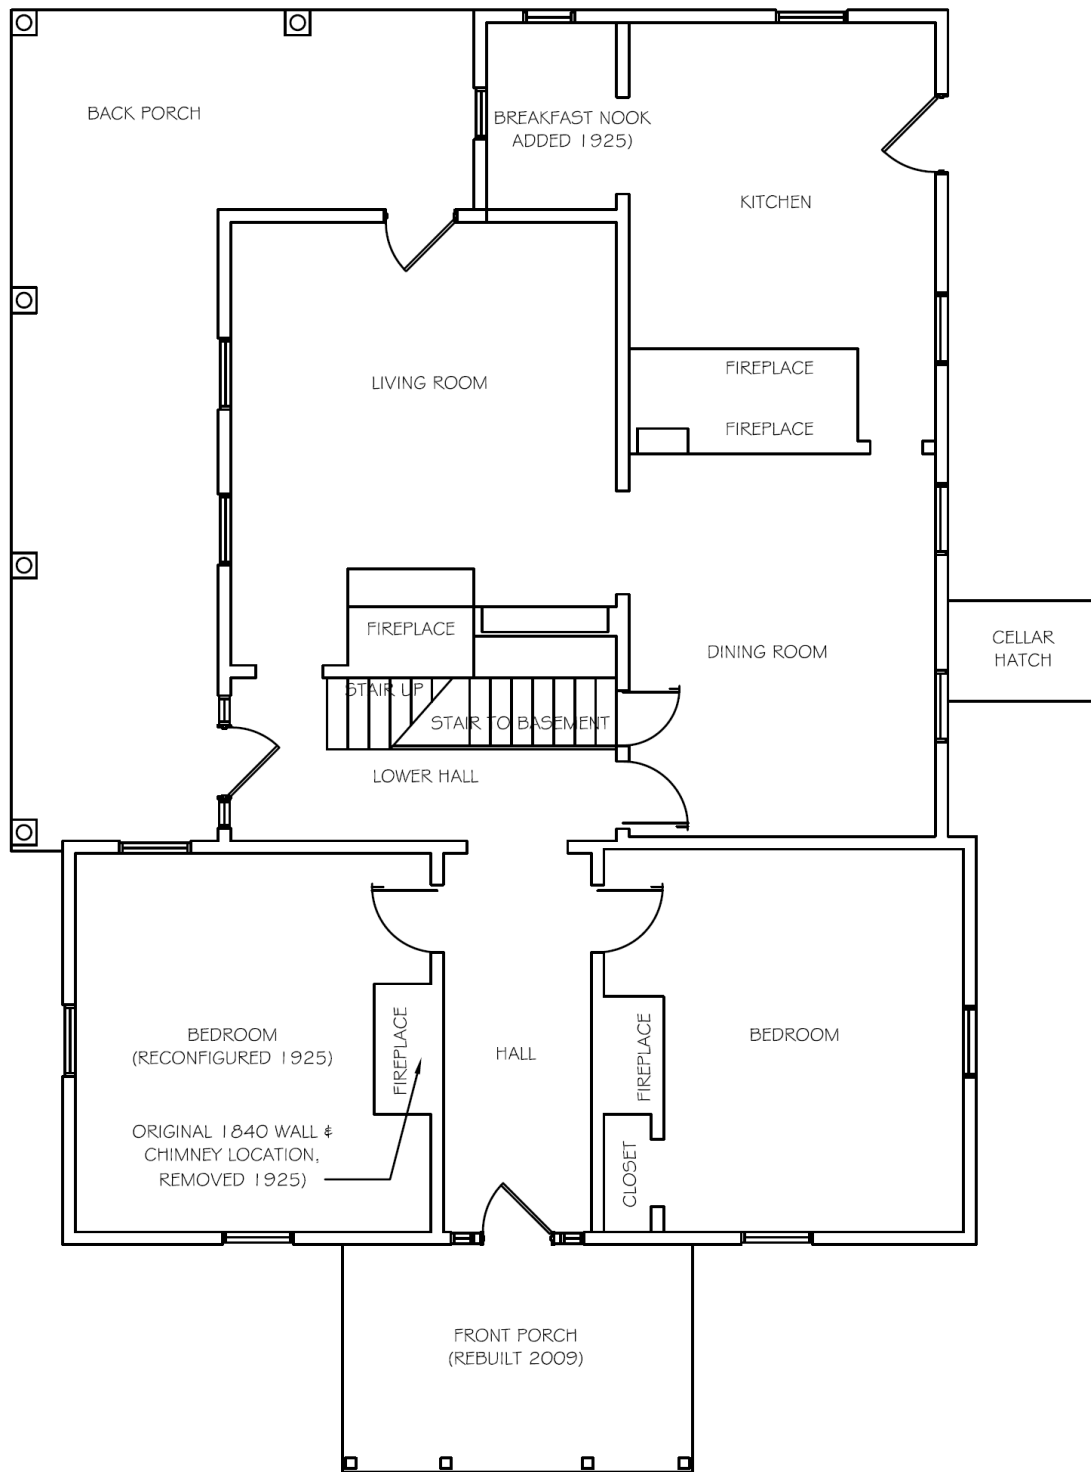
First Floor Plan of Hugh Murphy House prior to the 1925 renovation, showing the center hallway
